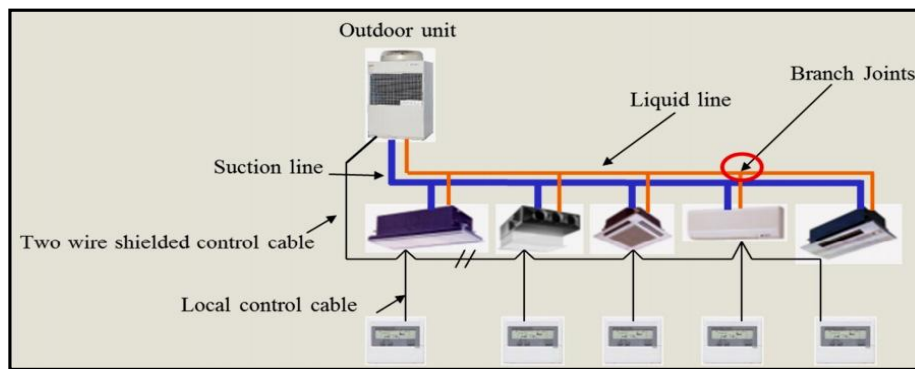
Types of Indoor Unit Connected with Outdoor Unit of VRF
